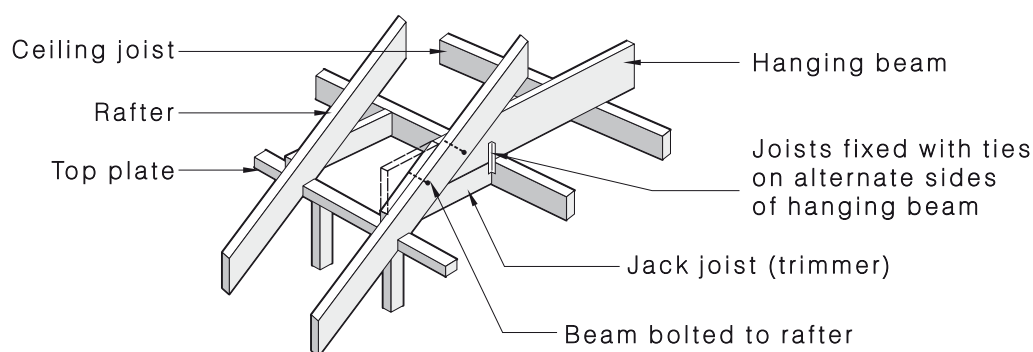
SUPPORT OF HANGING BEAM WITH JACK CEILING JOIST (TRIMMER)
